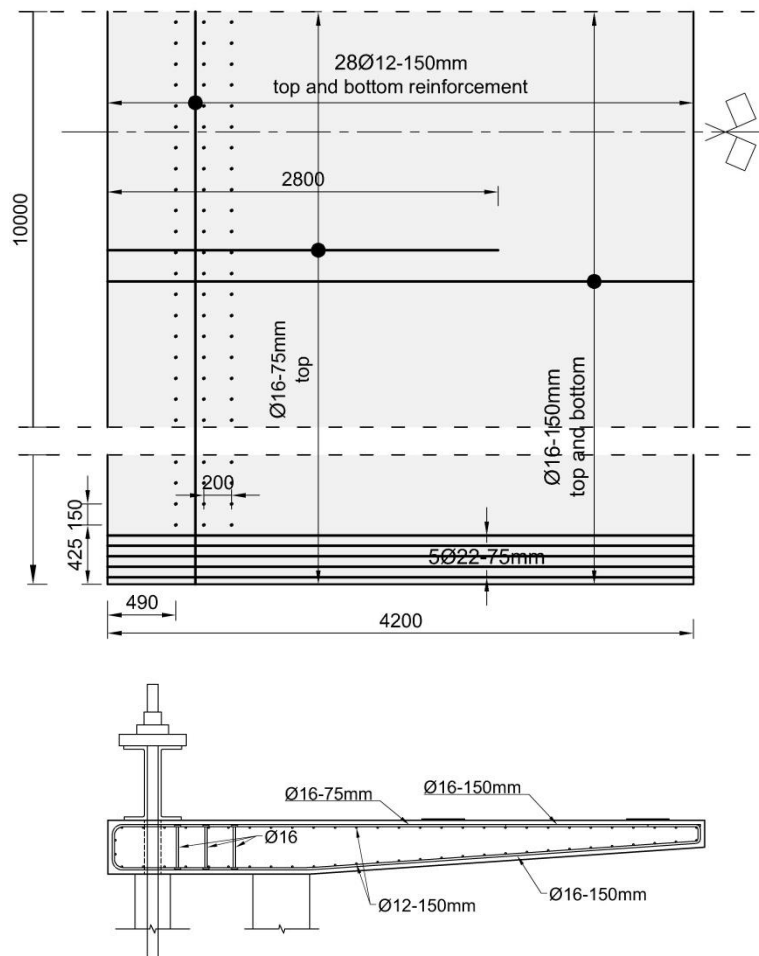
Case RS2. Top reinforcement details of the slab (in mm)
